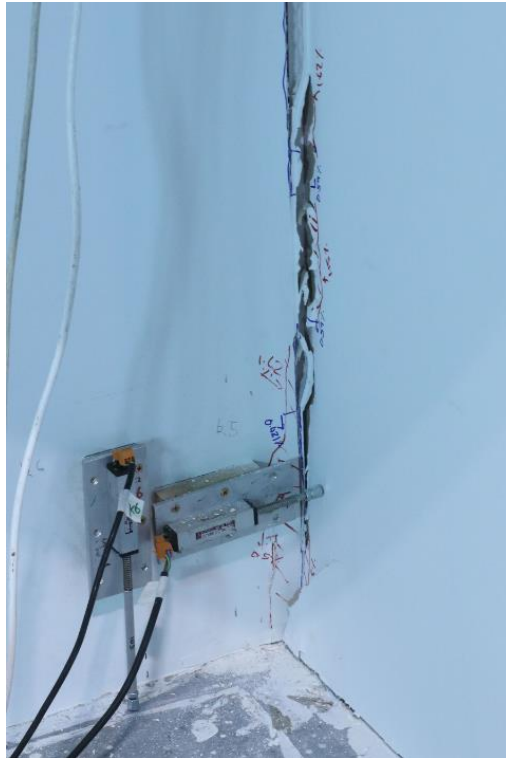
Specimen B1 – Step 14 – DS3: evidence that bottom track in return wall at L-junction has been damaged as main wall has pushed over bottom track – location 11
